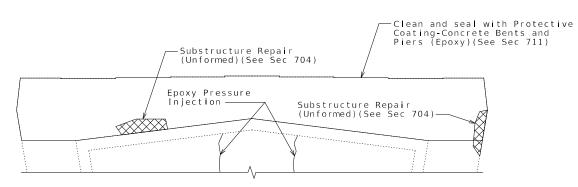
DETAIL SHOWING SUBSTRUCTURE REPAIR AT END BENT NO. 1
